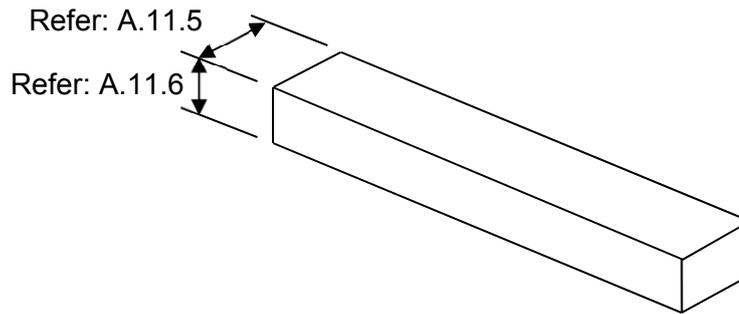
TYPICAL SILL BEAM DIMENSIONS
